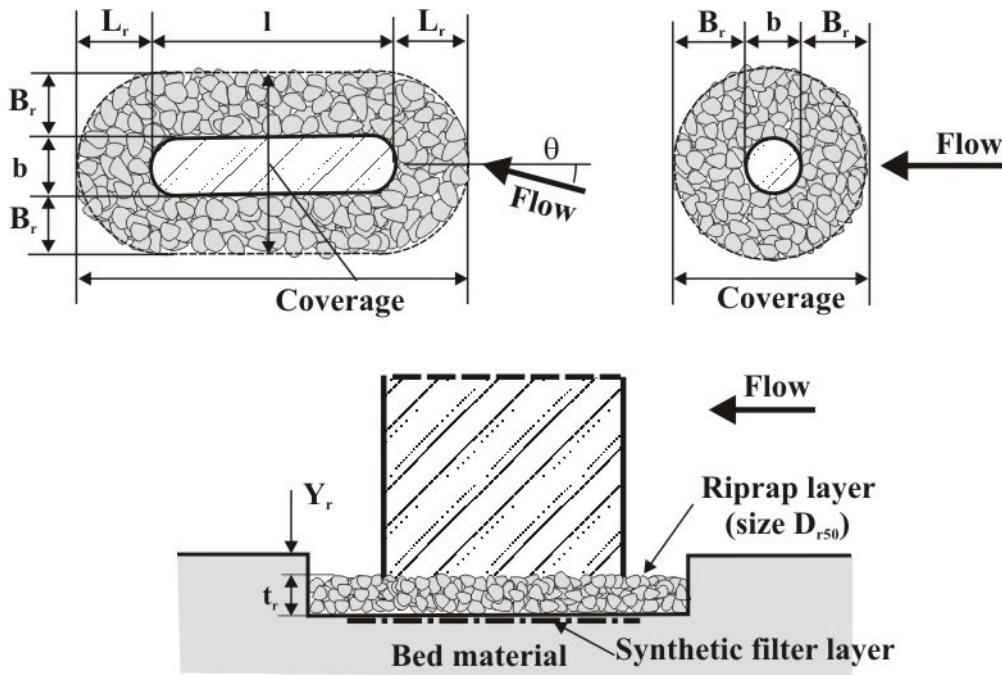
Definition diagram for placement of riprap protection at bridge piers.
